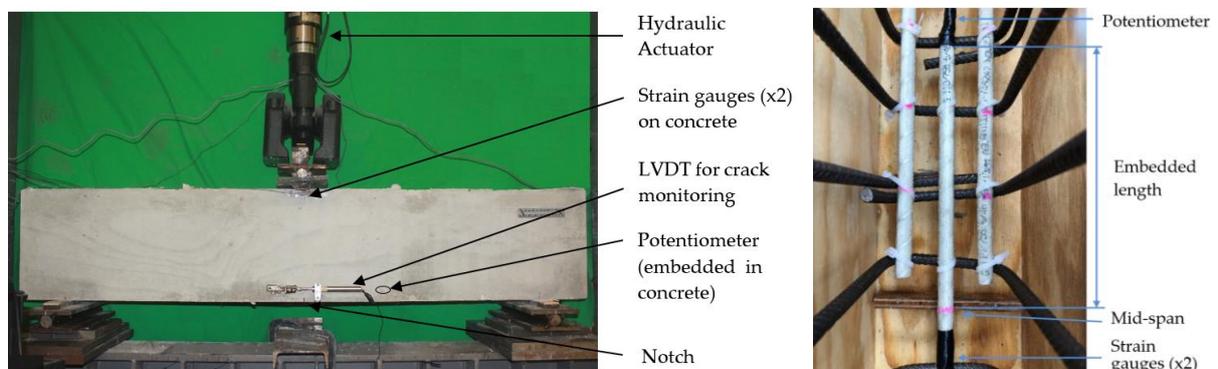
Test set-up (left) and plan view of the instrumented rebar in mid-span.
